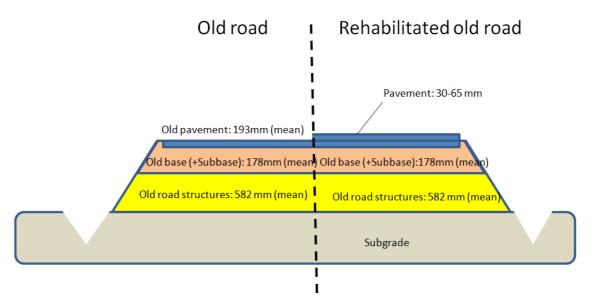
Strengthening structure for risk class sections 1, 2 and 3 in road section 505.
